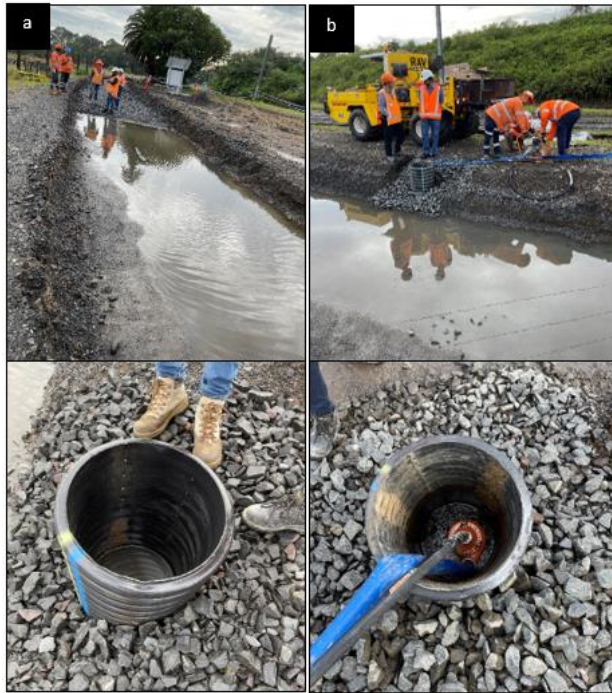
4: (a) Chullora track after heavy rainfall - Construction of sumps, and (b) Dewatering system
